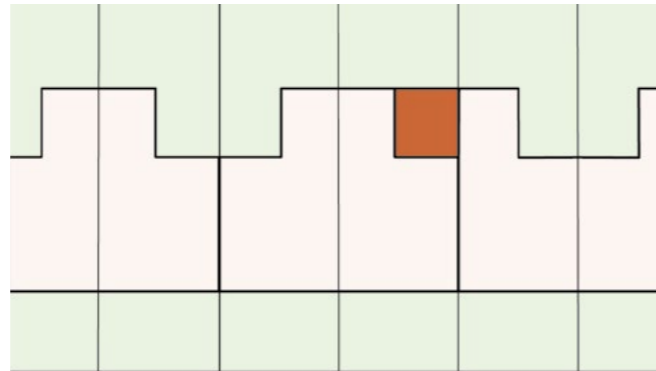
At terraced dwellings with existing two-storey extensions or outriggers, an infill two-storey extension may be acceptable provided it doesn't impact neighbouring amenity
